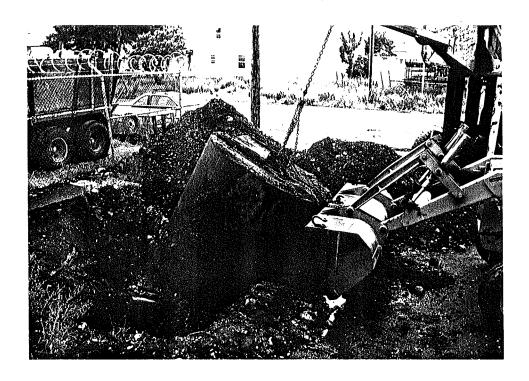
Excavating the UST. Note the broken water pipe in the lower right corner of the picture, Looking southwest.
